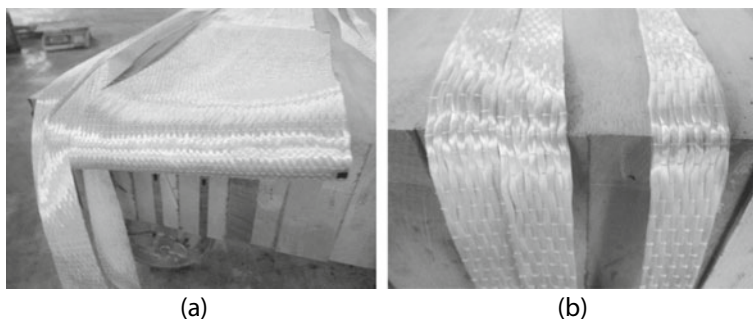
GFRP as reinforcement material a sheets and b strips
